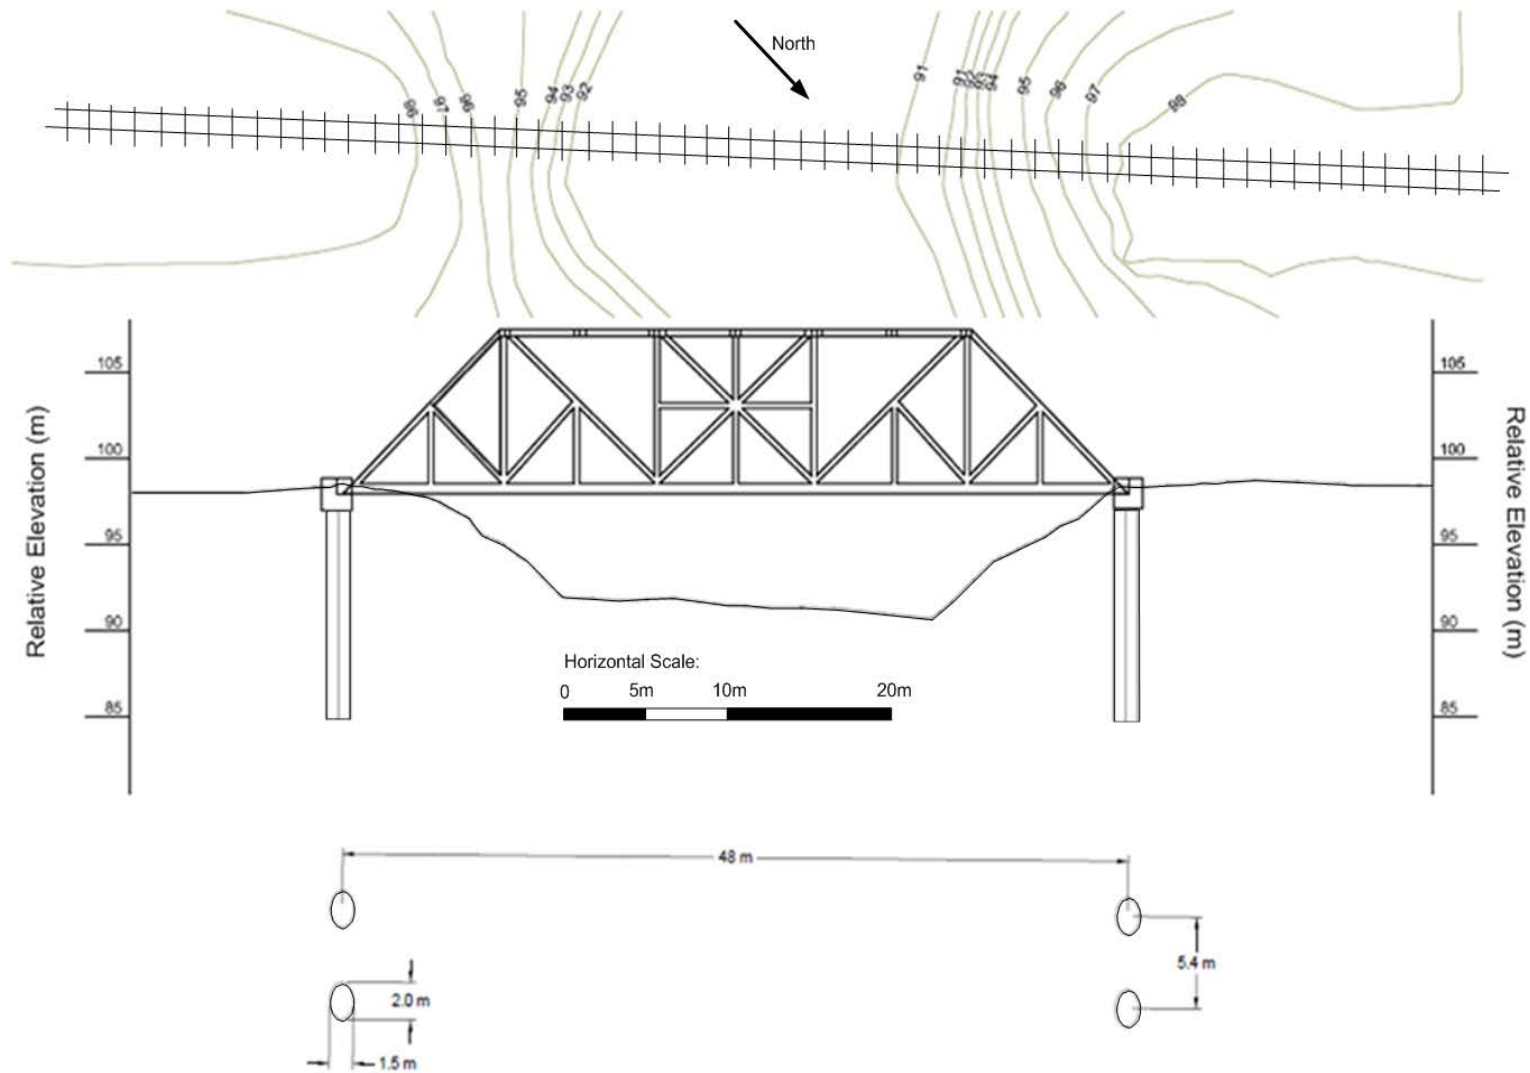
Simplified Sketch of the Plan and Profile Views of the Rio Bananito Railway Bridge
